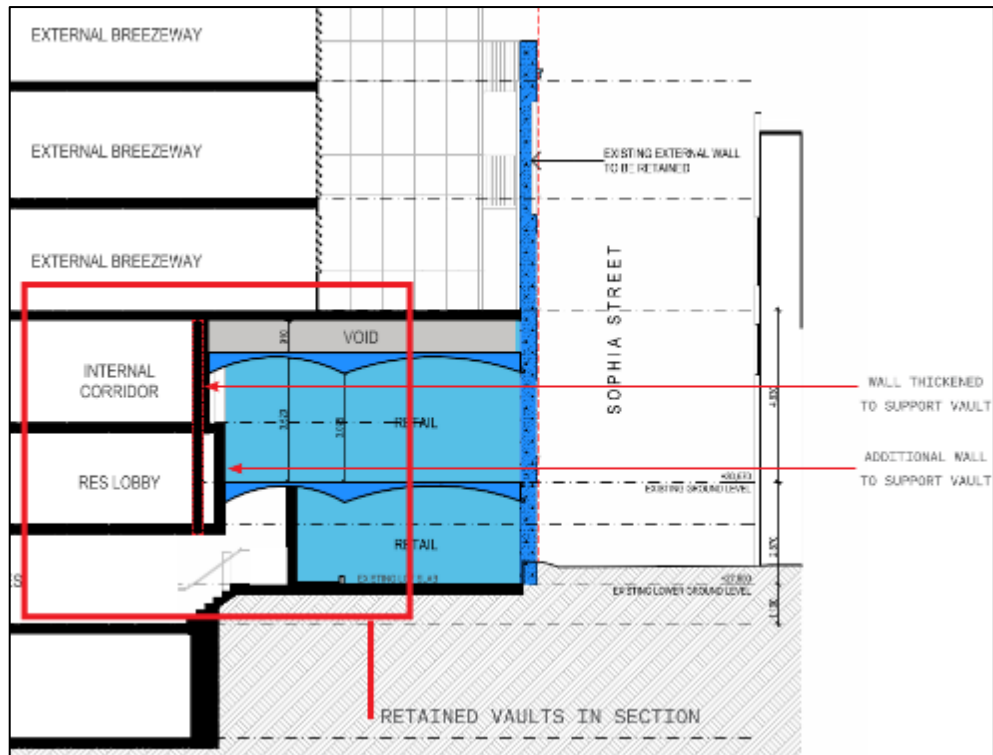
Proposed cross-section showing the retained arches and facade in blue
